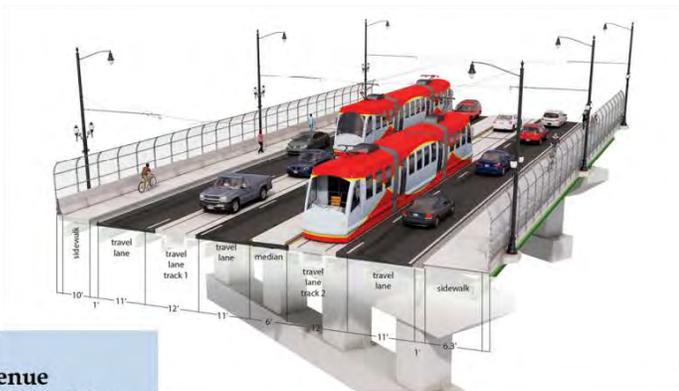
Build Alternative 2 Typical Sections (Wired Propulsion System)
